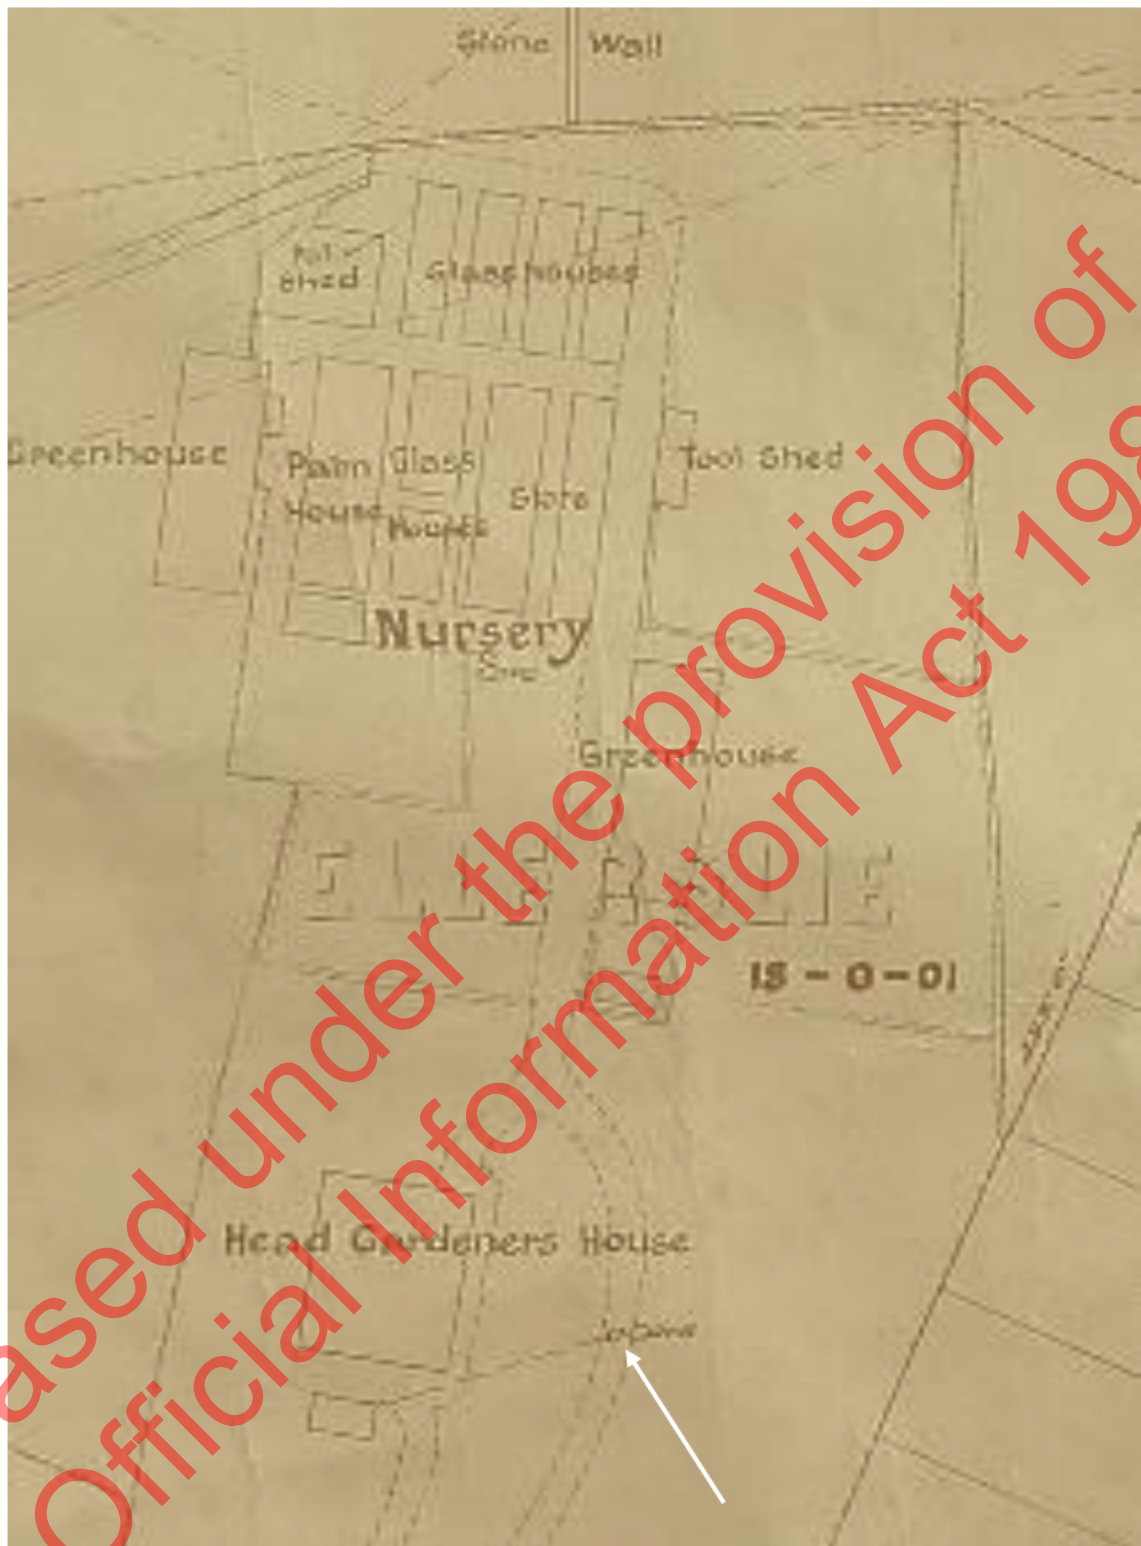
Enlargement of 1925 plan showing location of Cave 4 east of the Head Gardeners House
